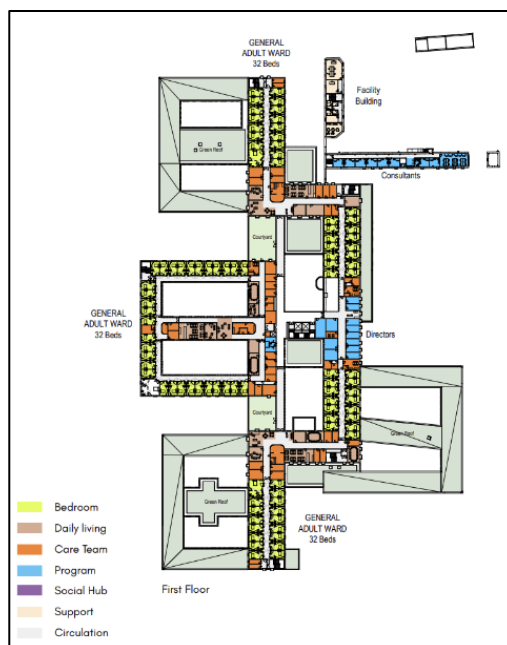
Image of the first-floor level of the proposed 200 No. bed hospital development (Source: Architectural Design Statement - TOT Architects, 2026).
